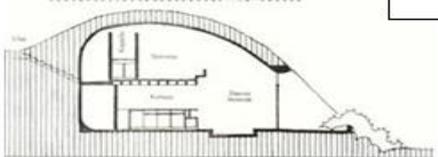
Above: plan shows both units (Half ground floor and have 1st floor)
